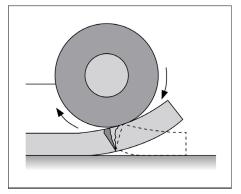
Corner cracking of curled slabs under heavy traffic is a common symptom of curled ground slabs, particularly if load-transfer is absent or compromised; the elevated corner essentially becomes an unpropped unreinforced cantilever
